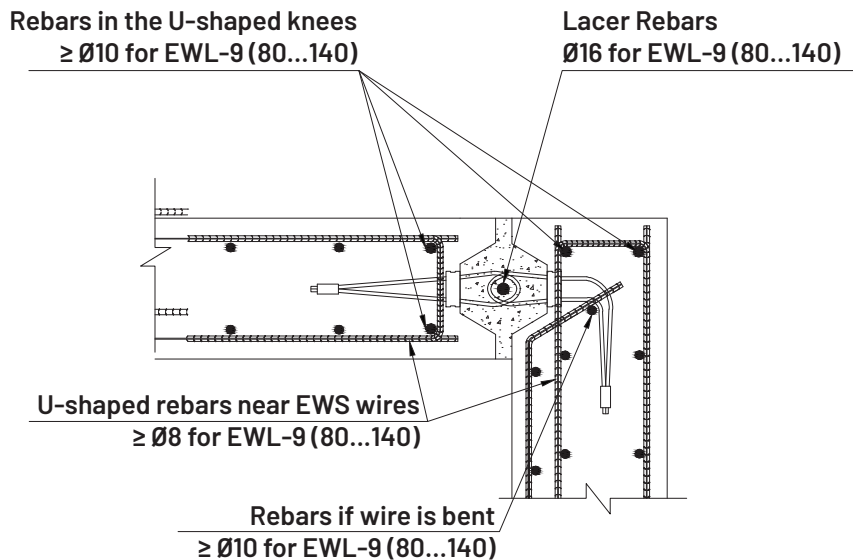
Reinforcement at Wall End with EWL-9 Wire Loops
